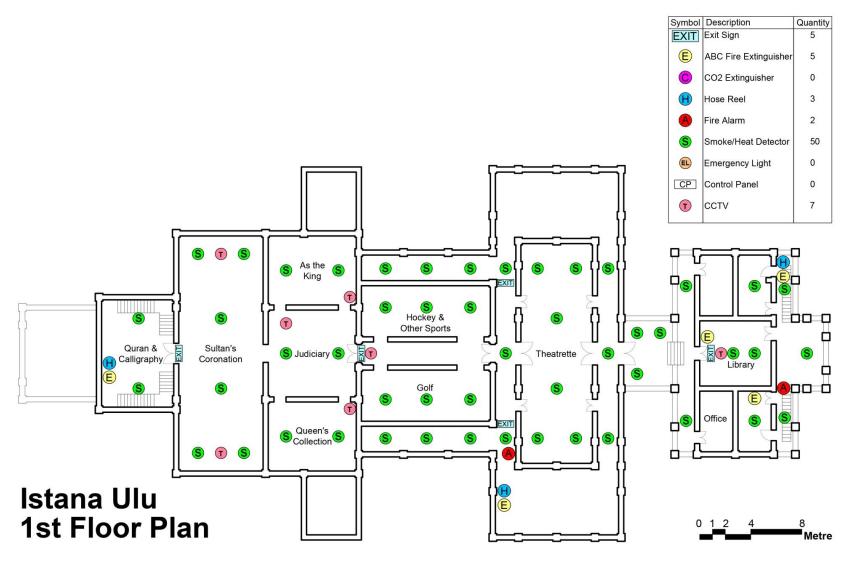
Location of active fire protection measures at FirstFloor Level of Sultan Azlan Shah Gallery
